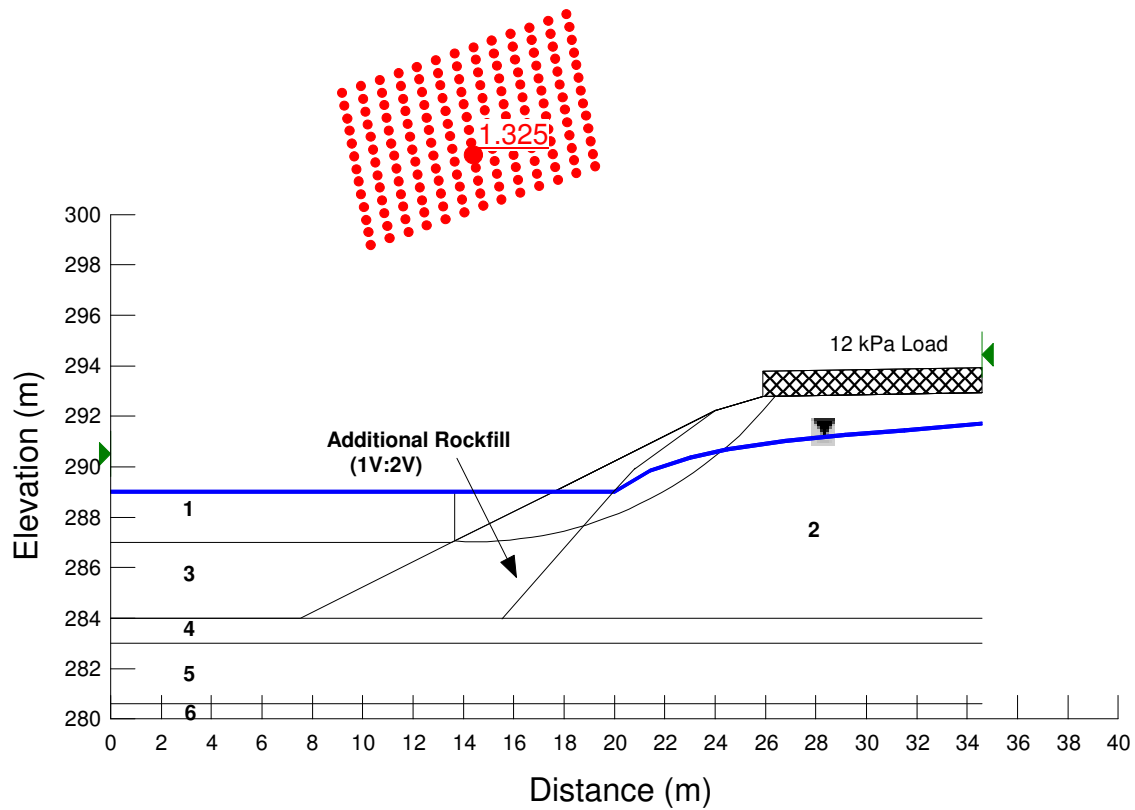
Stability of HWY11 Road Section at Sta. 14+850
